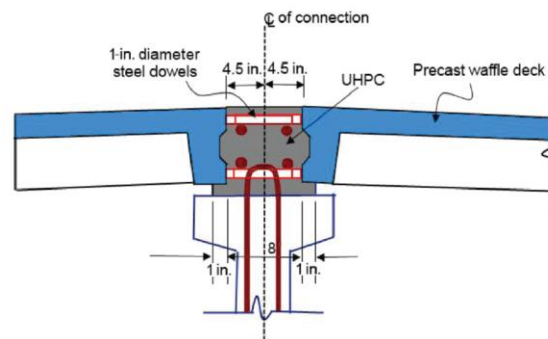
Panel-to-panel and panel-to-girder connection [62]
